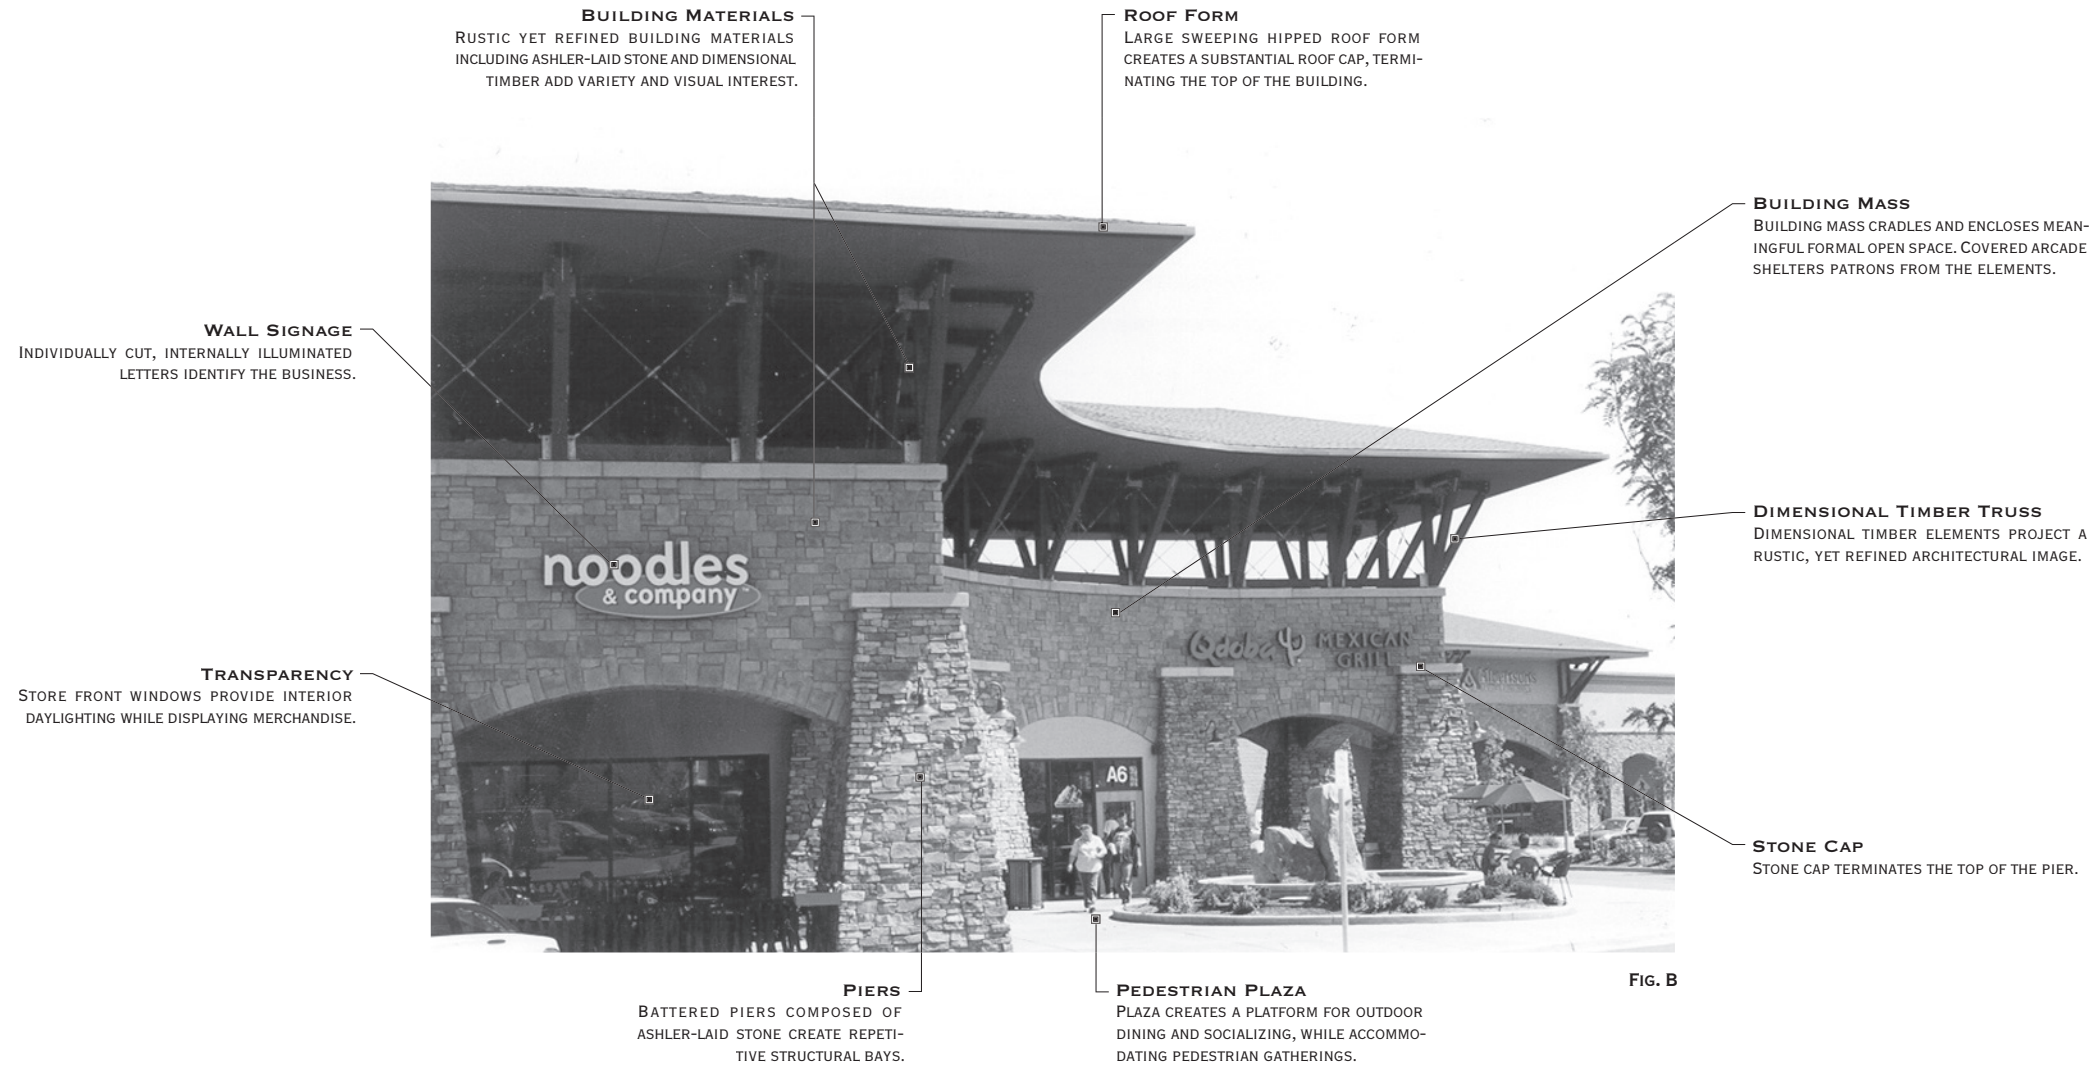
Segment retail storefronts into a series of structural bays composed of piers, spandrels, and bulkheads that define storefront windows and transoms.
